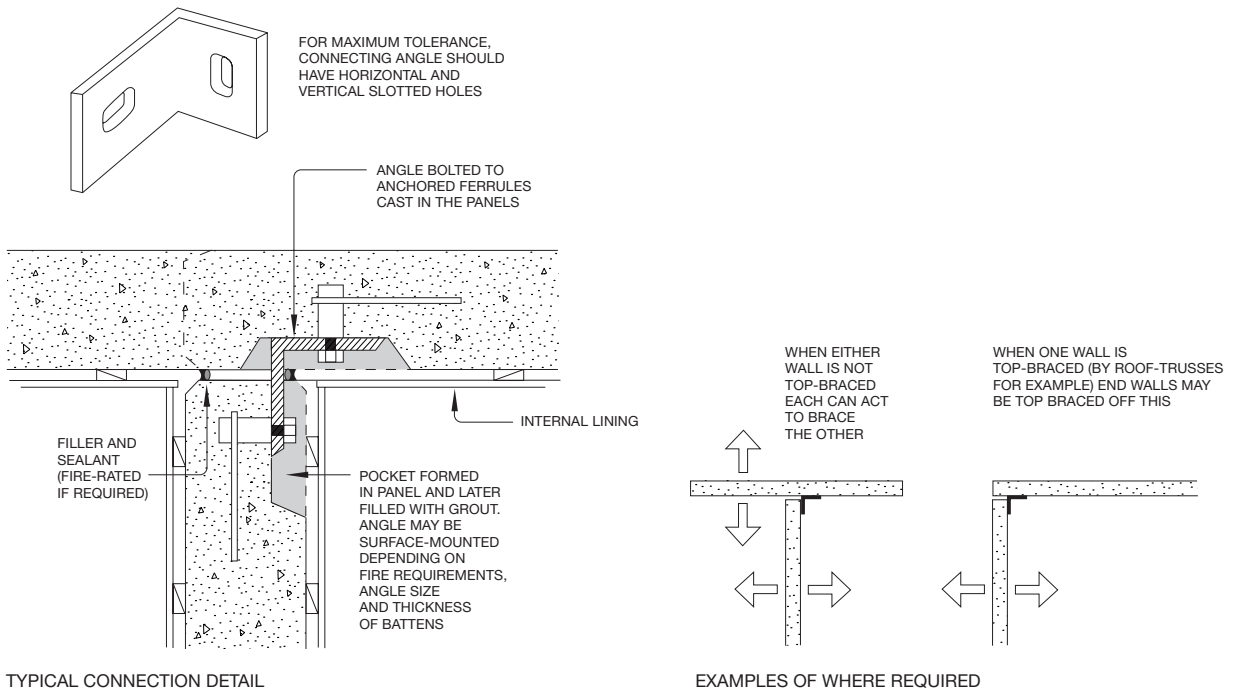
Plan View – Panel to Panel Top Corner Restraint. (Recessed angle bracket, bolted to cast-in ferrules to internal back face of panels)
